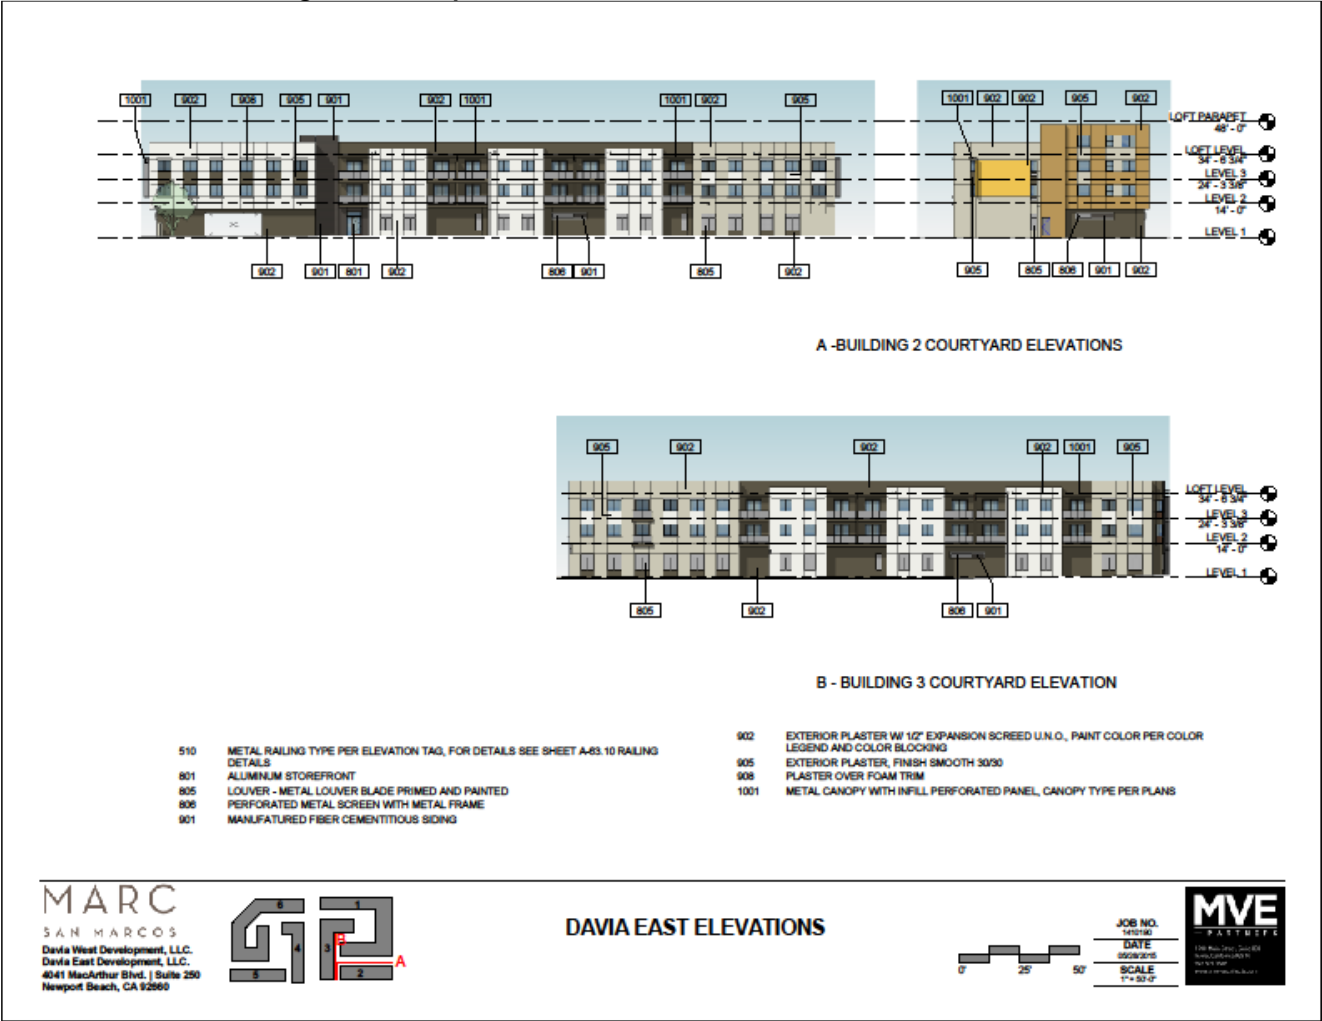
Davia East - Building 3 Courtyard Elevations
